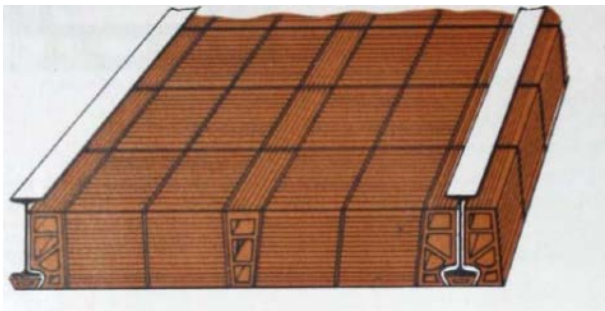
Flat arch construction as depicted by the National Fireproofing Company of Canada.
